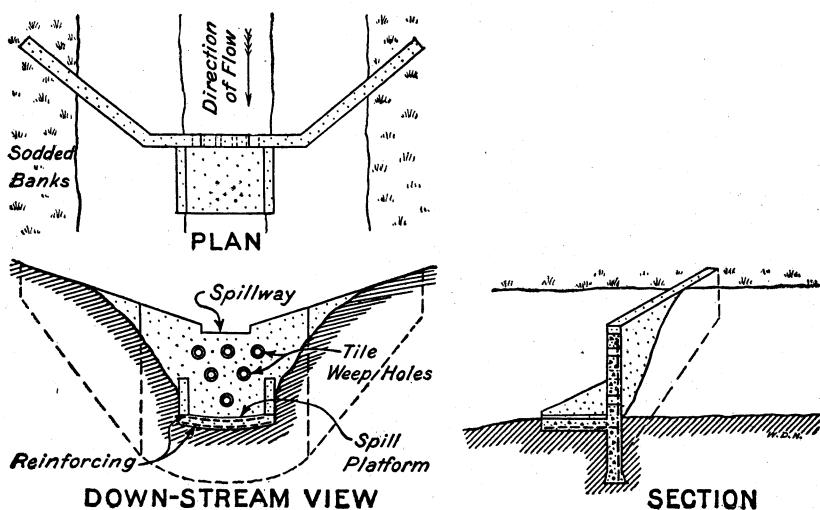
Plan, section, and downstream view of a concrete dam especially designed to guard against the common causes of failure<sup>8</sup>
